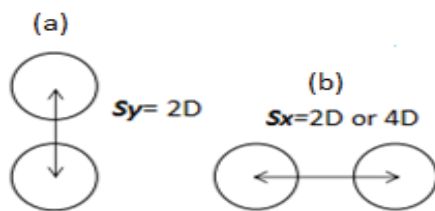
(a) vertically aligned tunnels (b) horizontally aligned tunnels
